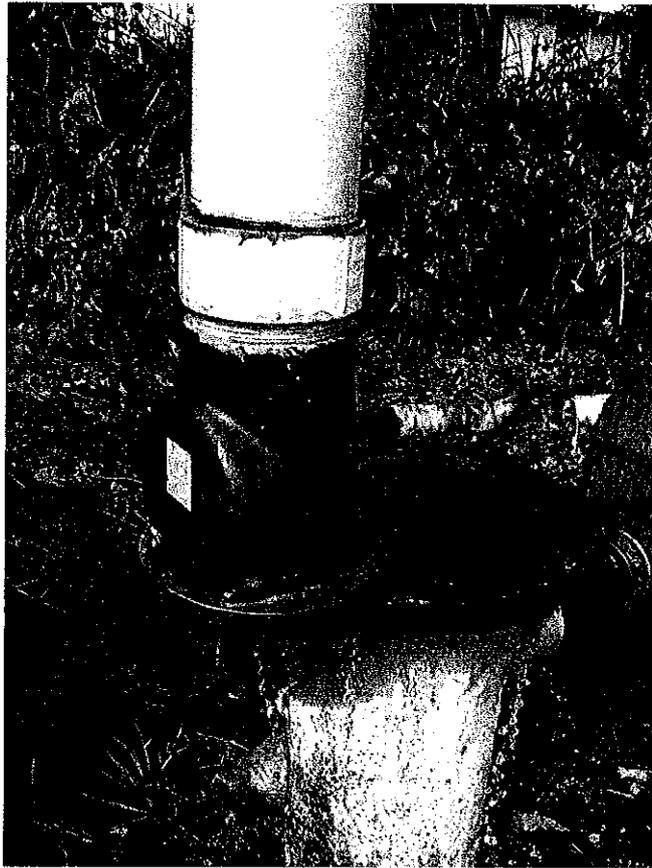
Brookville Gardens Well Drop Pipe Foot Valve
